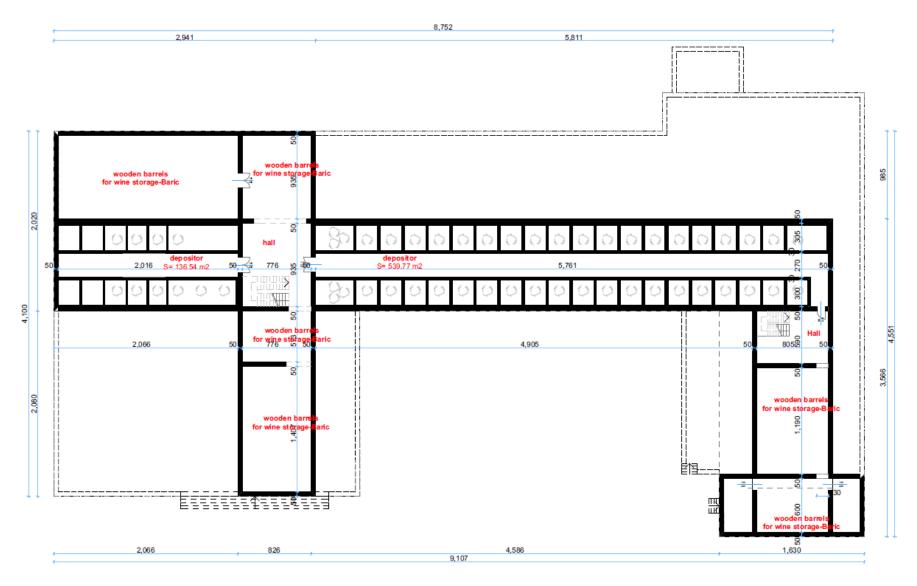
Basement floor plan of winery "Bodrumi i Vjetër" (ex-NBI-Rahovec before privatization)
